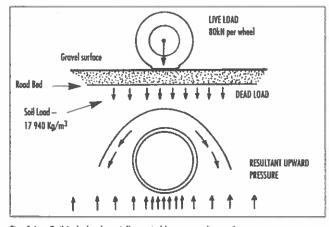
Soil-Arch, load partially carried by surrounding soil.
